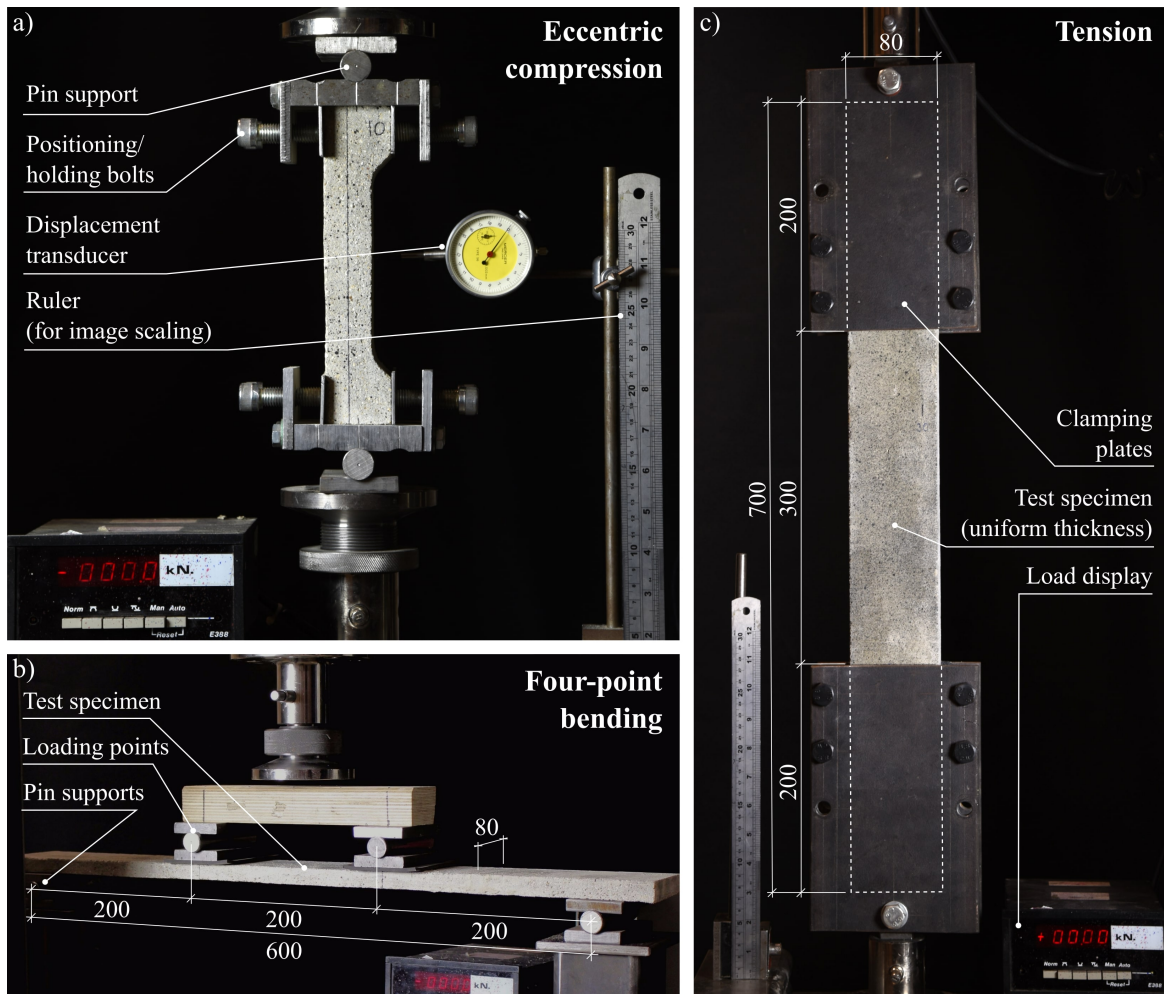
TRC testing arrangements showing a) eccentric compressions tests, b) four-point bending tests and c) tensile tests (dimensions in mm).
